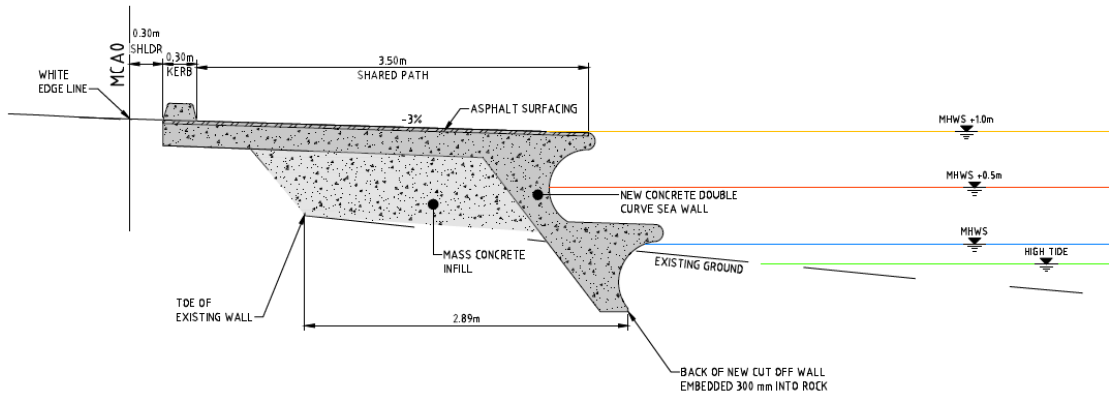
Schematic of proposed seawall at Point Howard Beach showing MHWS elevation after periods of sea-level rise. Cross section at Chainage 1060m.
